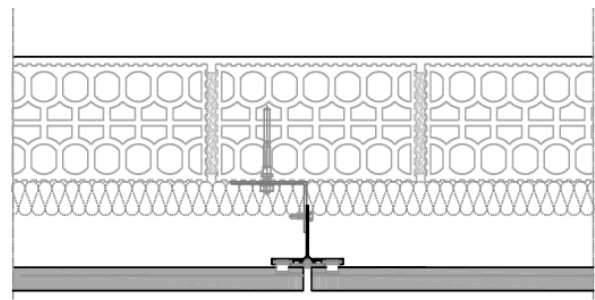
Vertical section. Faveton® SAH Acqua 20-H.
